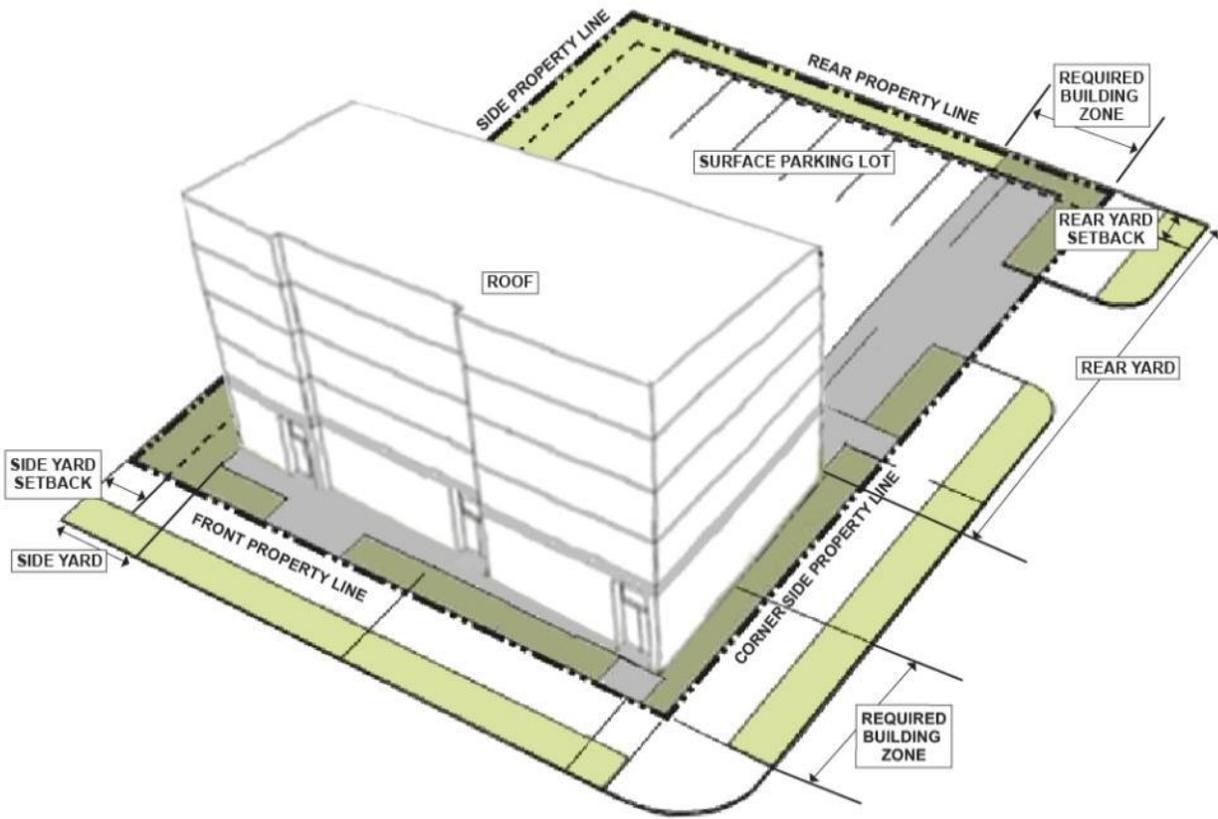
POTENTIAL ELEMENTS OF A BUILDING SITE
